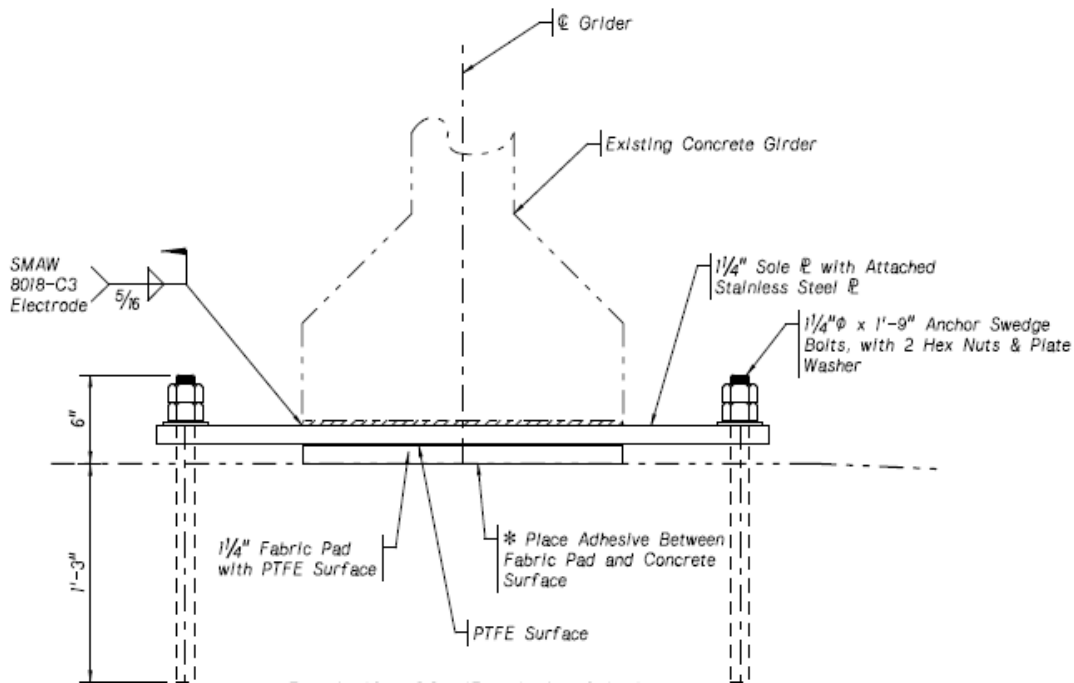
Bearing assemble replacement detail, from the repair documents of Platte River South Bridge, courtesy of NDOT
